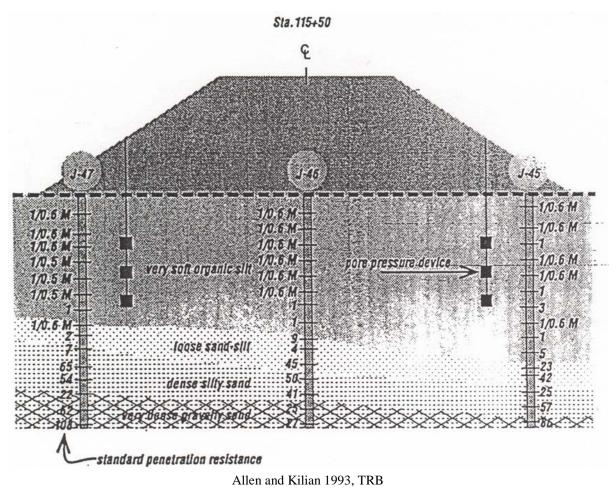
Soil cross-section at wood fiber fill location, Washington project.
